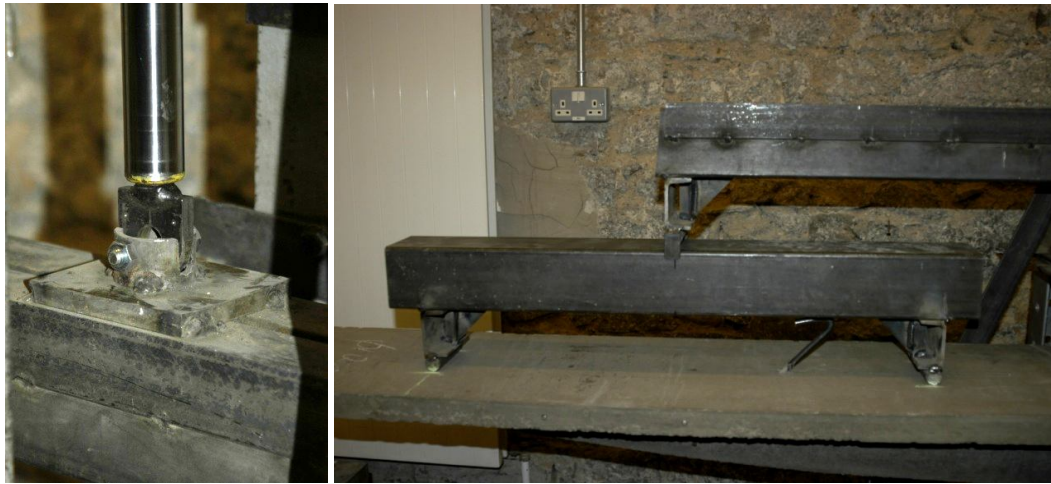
The bolt connection at the primary loading element (left), and the secondary loading element in contact with the primary loading element (right)
